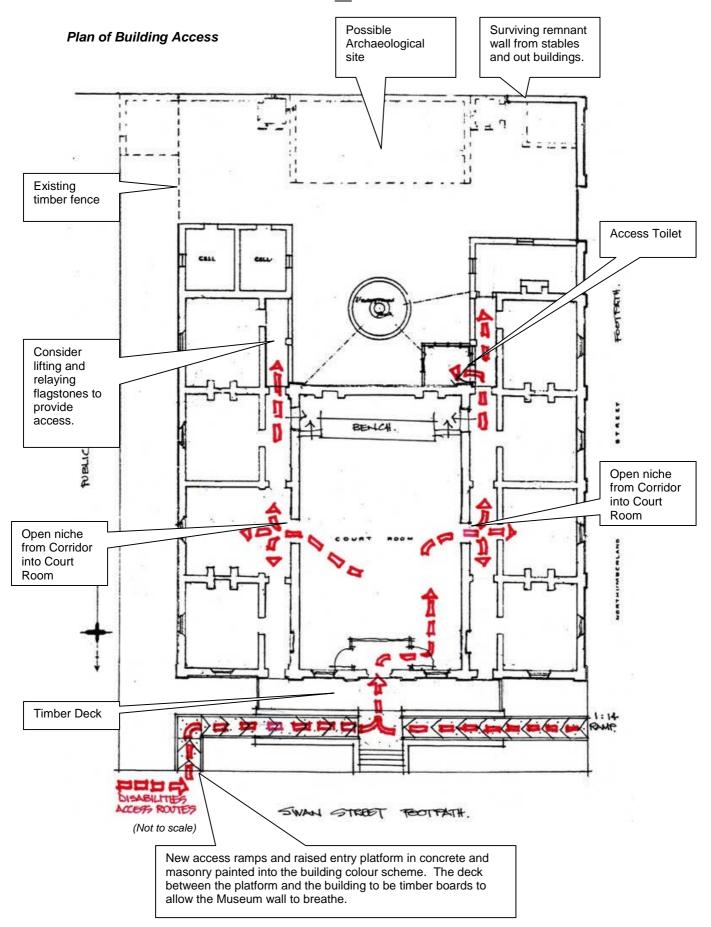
Concept Plan Showing Areas for Accessible Paths to and Through the Building
